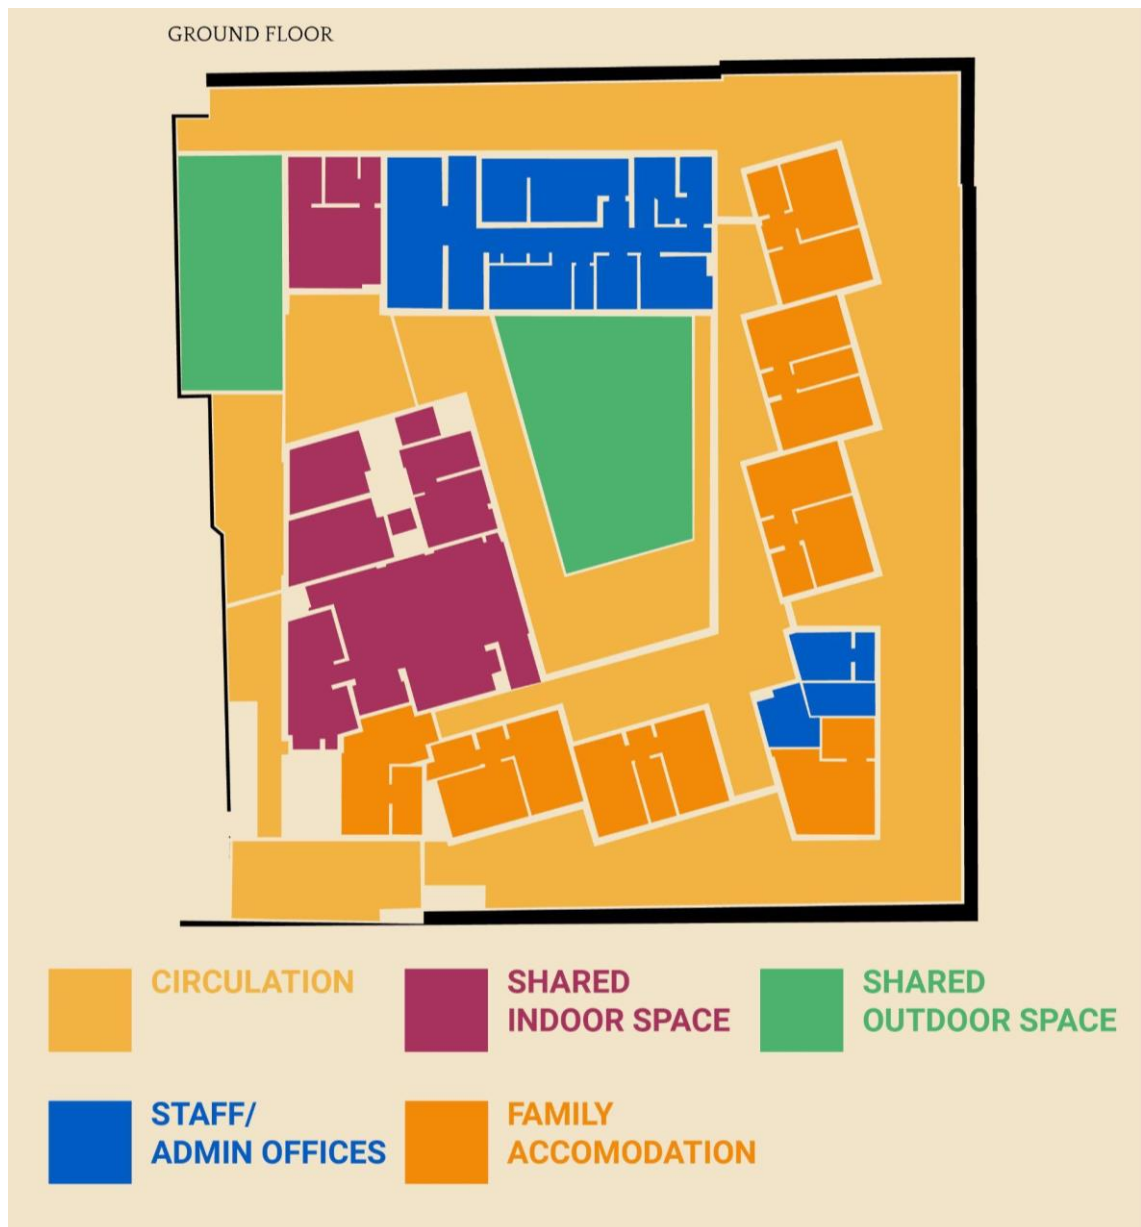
The Ada and Tamar House Ground Floor Plan Diagram
